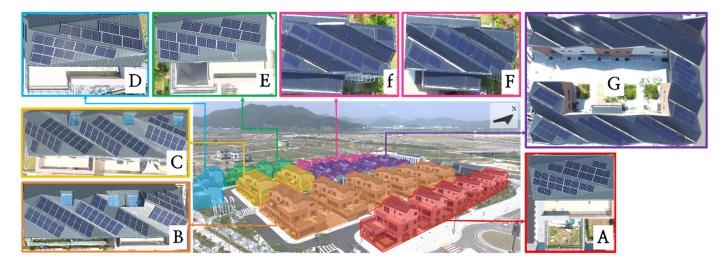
29 Buildings divided into 8 sessions and PV systems installed differently in each building.
